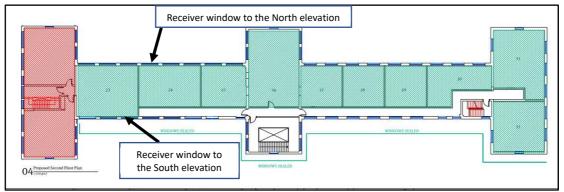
Image showing the closest residential windows and site layout (Drawing source: Papa Architects)
